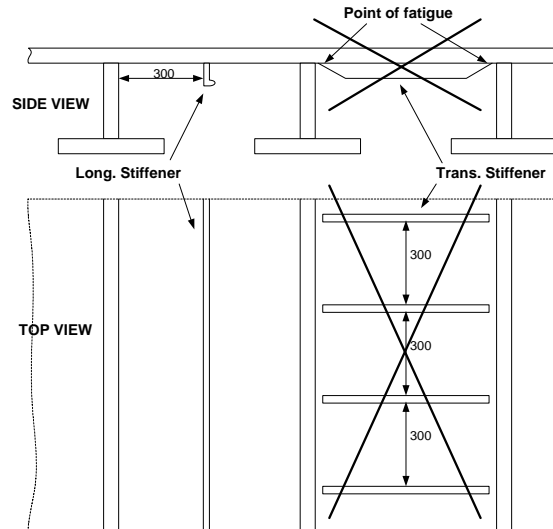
Illustration of longitudinal and transversal stiffeners of a deck plate
